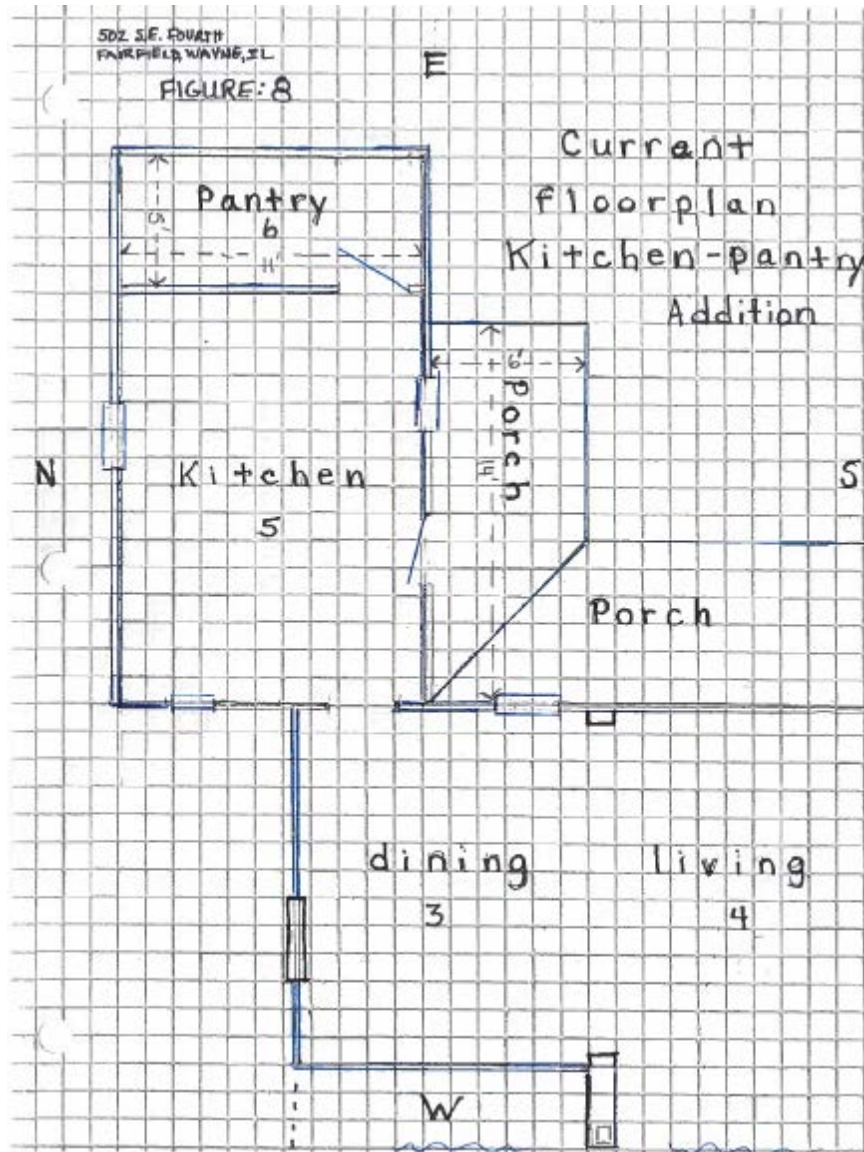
Current Floor Plan Kitchen-Pantry Addition
